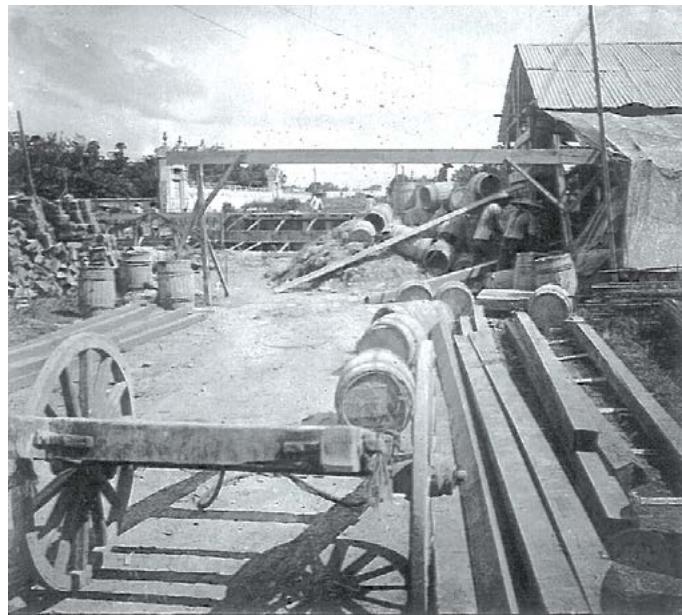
Construction site of Ananta Samakhom Throne Hall, January 1909, showing foundation work with imported cement stored in wooden barrels © NAT
